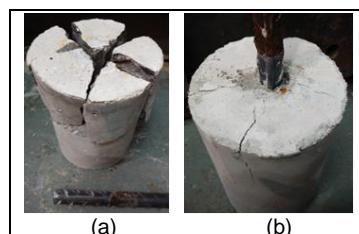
Failure mode of specimen (a) NC – splitting; (b) SFRC - pullout
